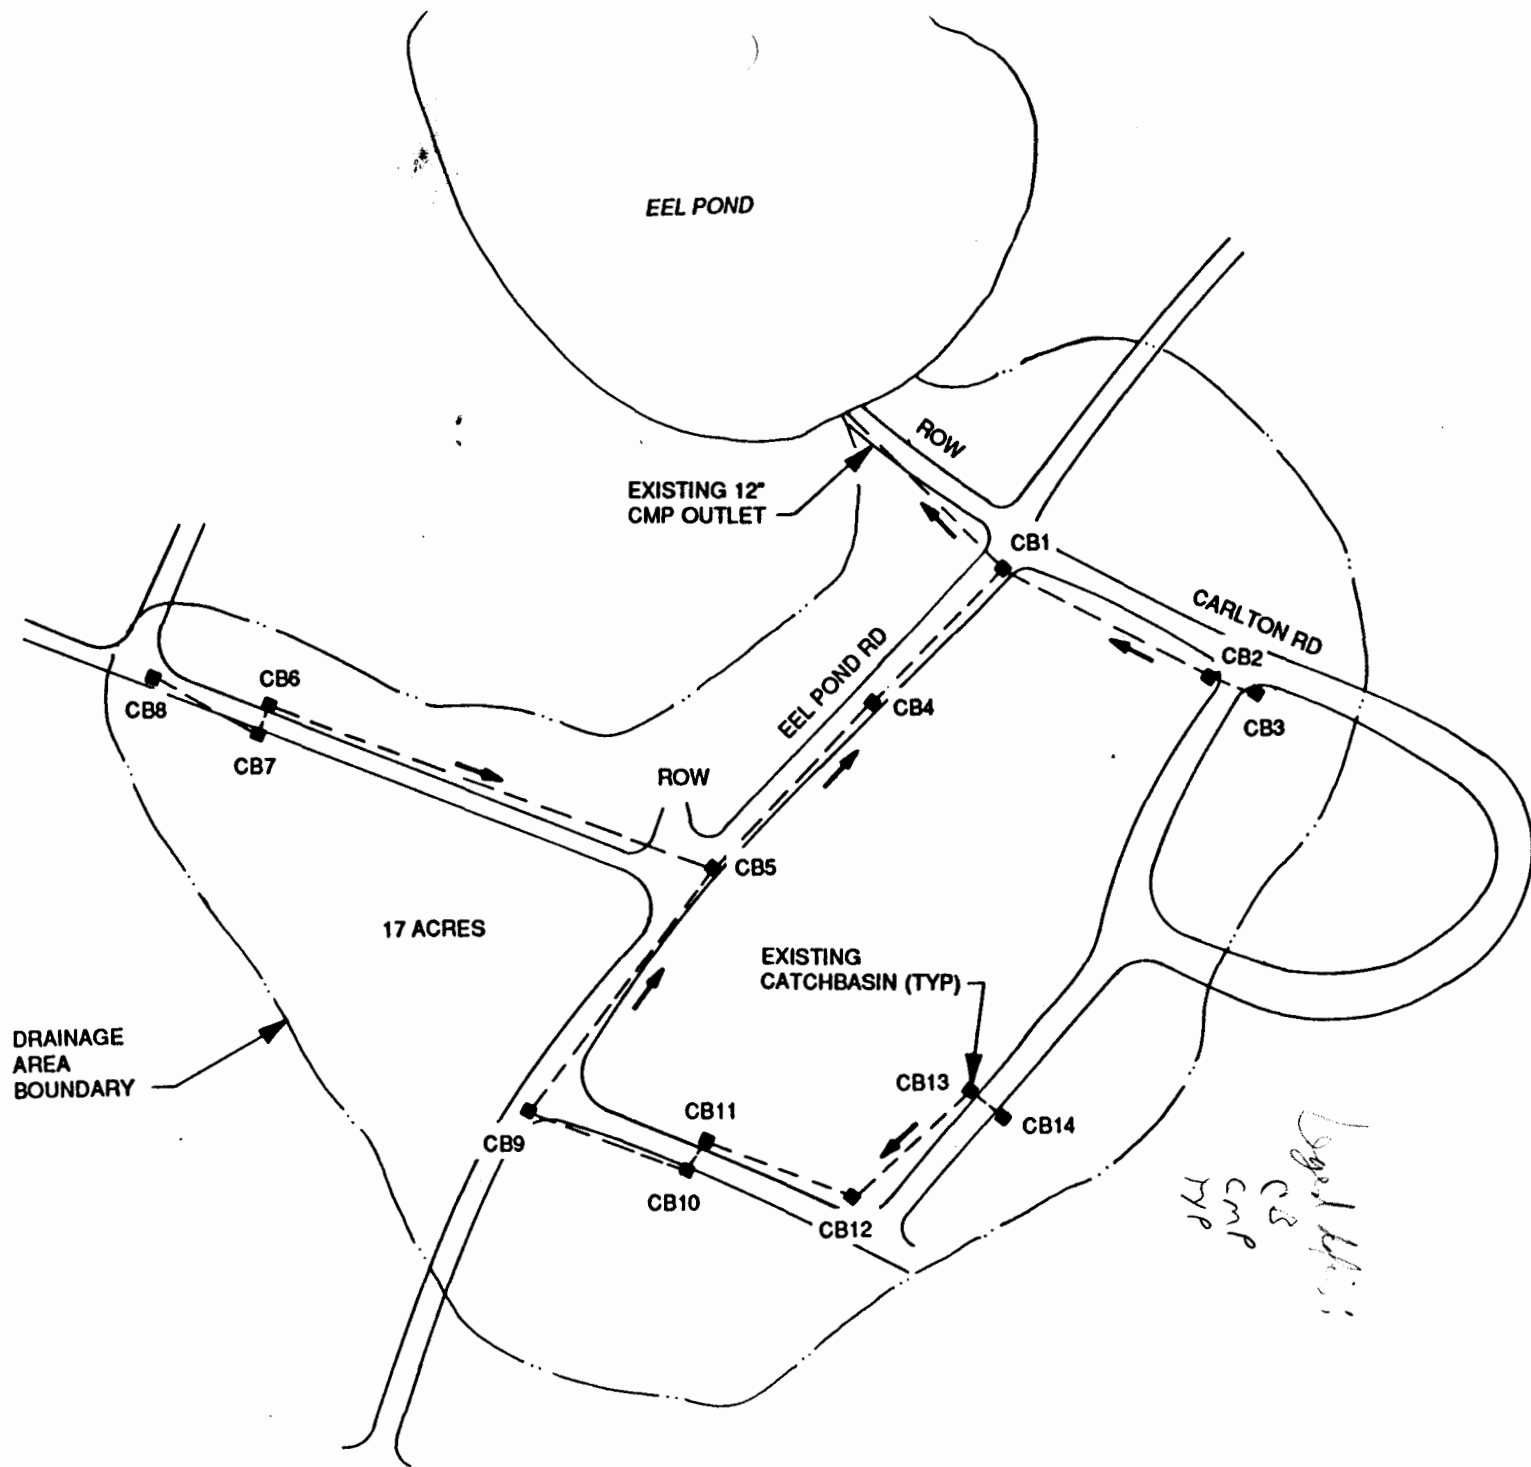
CARLTON ROAD DRAINAGE SYSTEM
